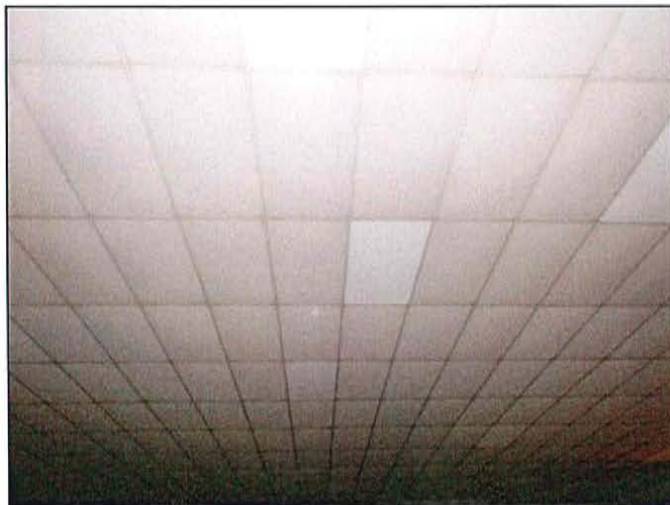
1' x 1' Ceiling tile with adhesive pucks
